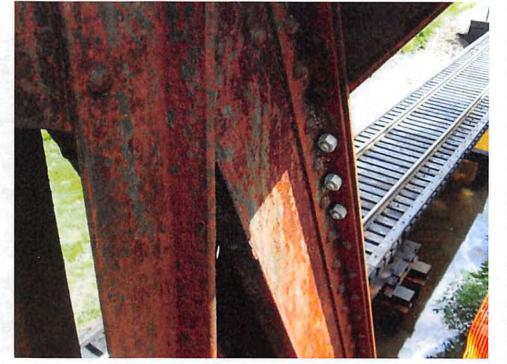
Location: U7-L8 North Truss Date: 6/18/2014
